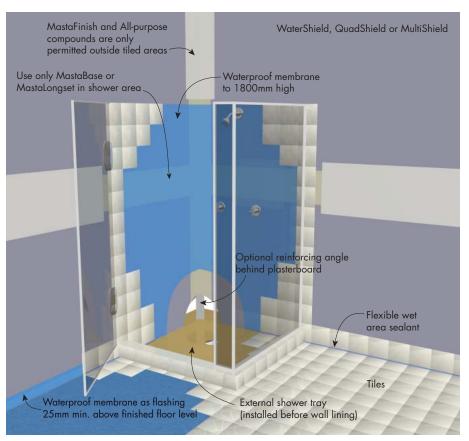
External Tray for Enclosed Shower on Timber Flooring
